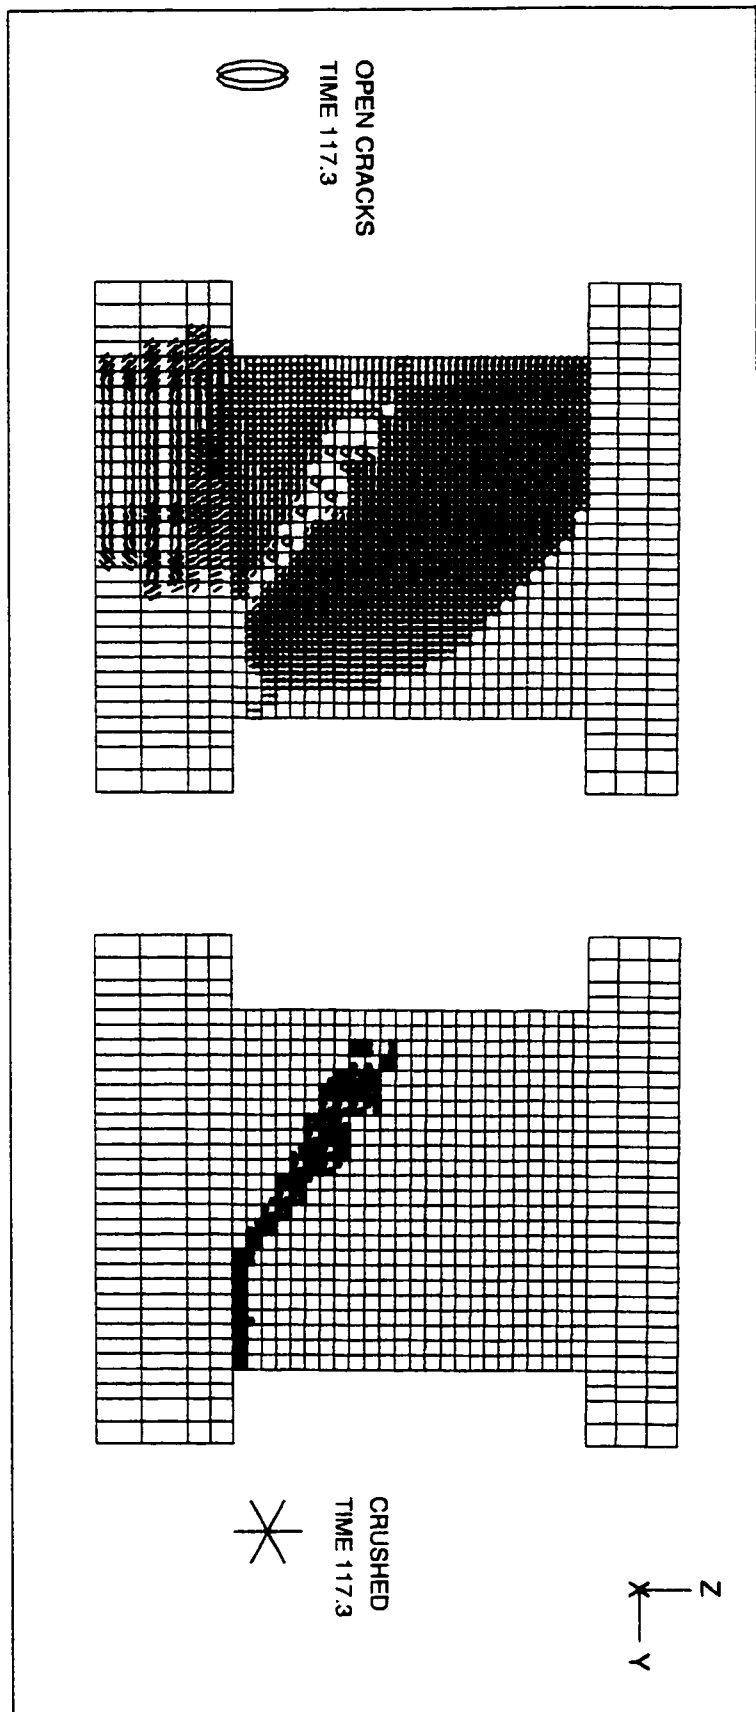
Cracking and crushing pattern of shear wall N5
